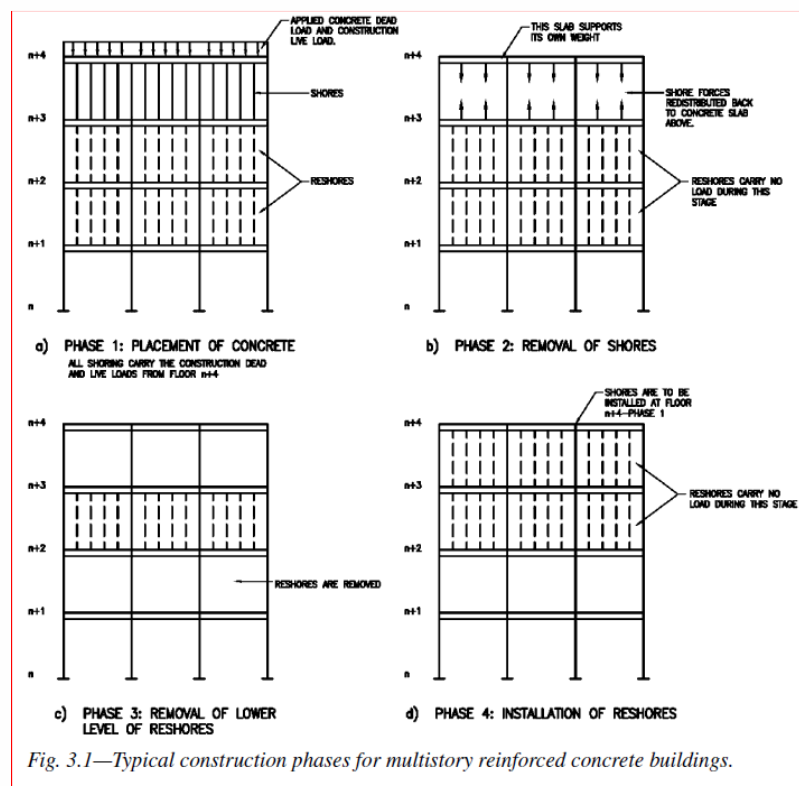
Typical construction phases for multistory reinforced concrete buildings.
